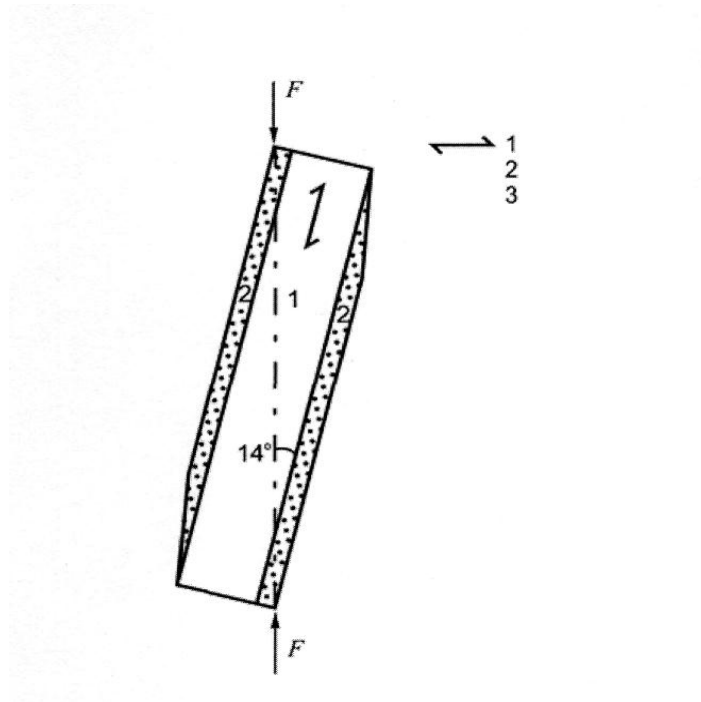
Loading arrangement: 1 - grain direction; 2 - steel plate; 3 - timber test piece
